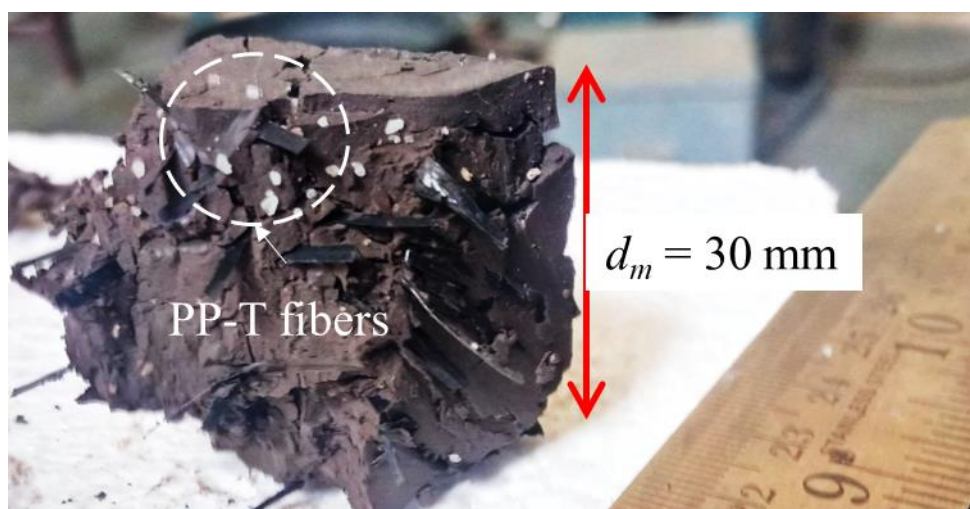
Cross section of cracked specimen reinforced with PP-T fibers [Test: FR14]
